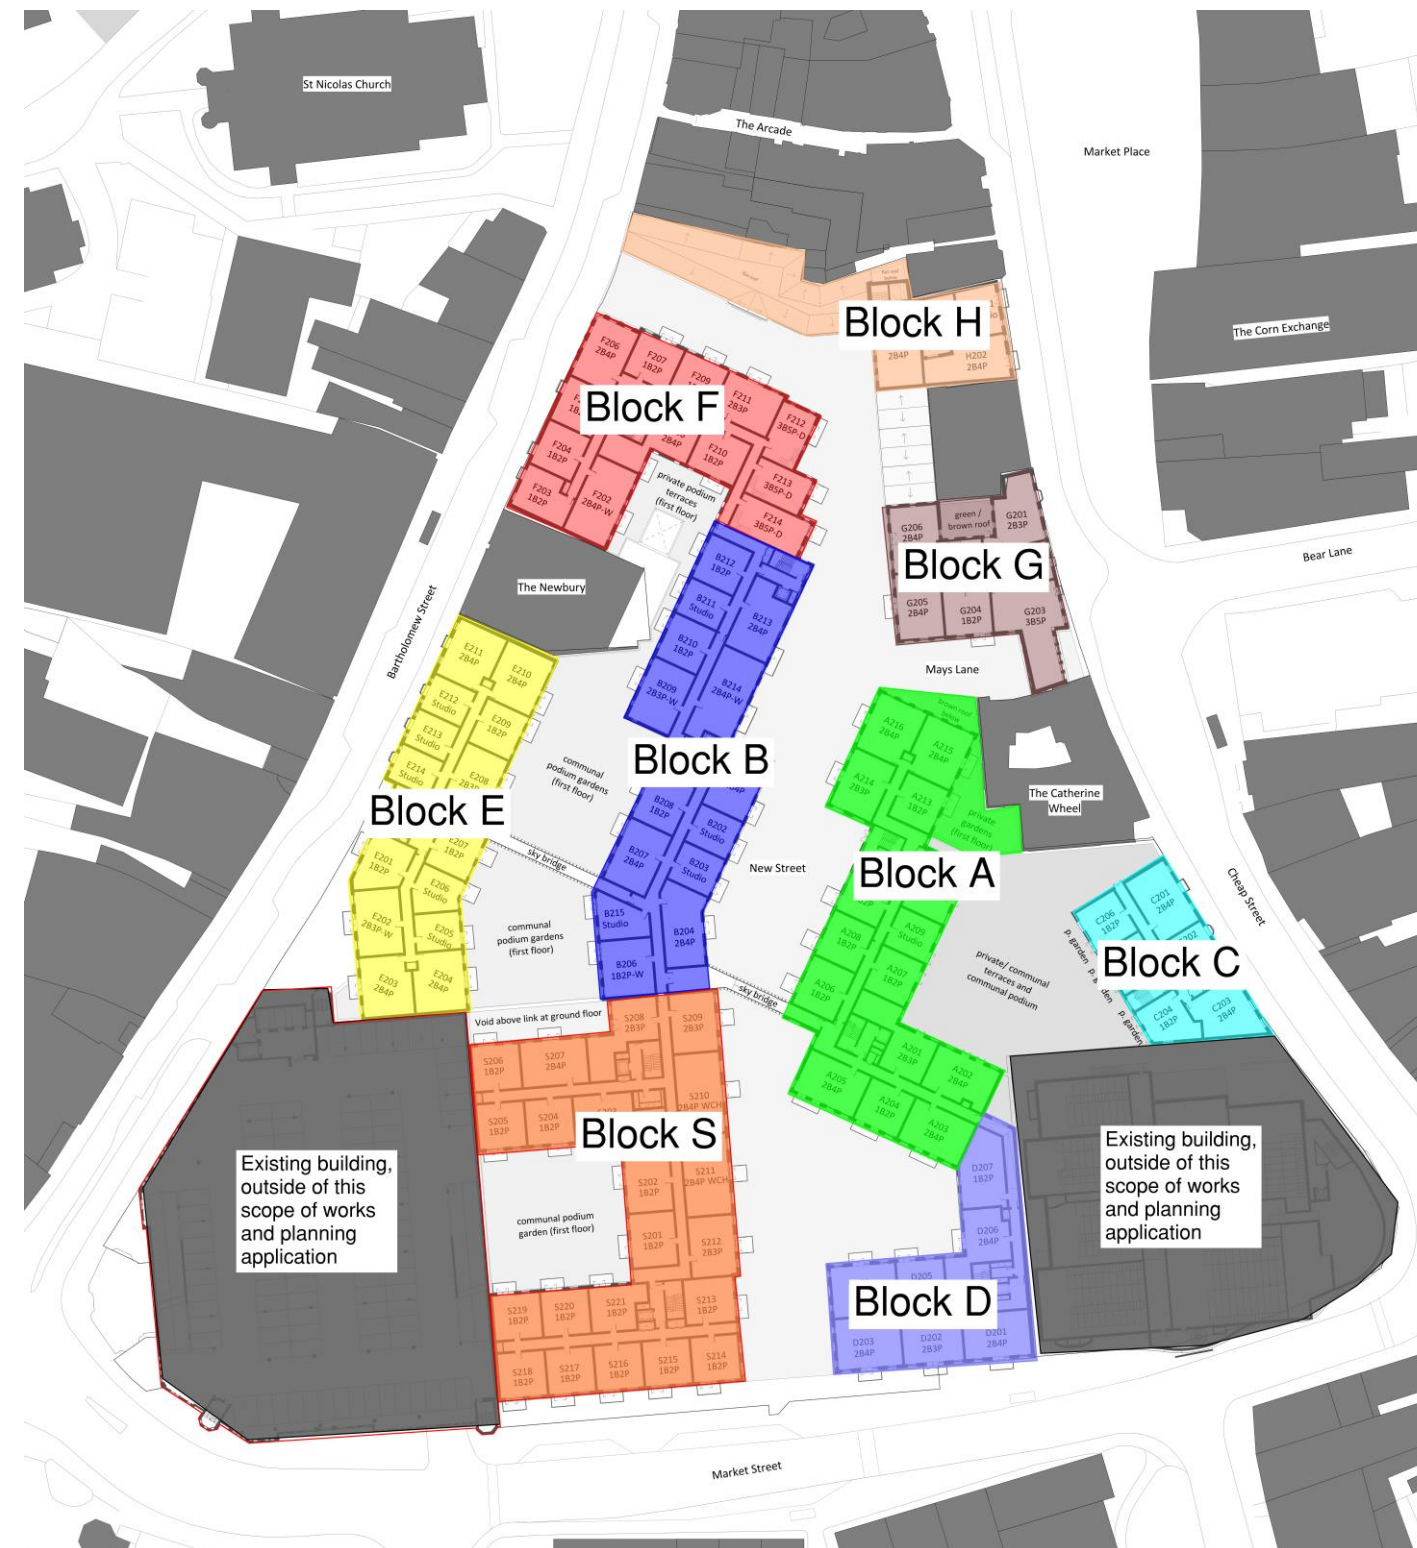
Site Layout Plan- Proposed Blocks A, B, C, D, E, F, G, H and S. (shown at First Floor level)
